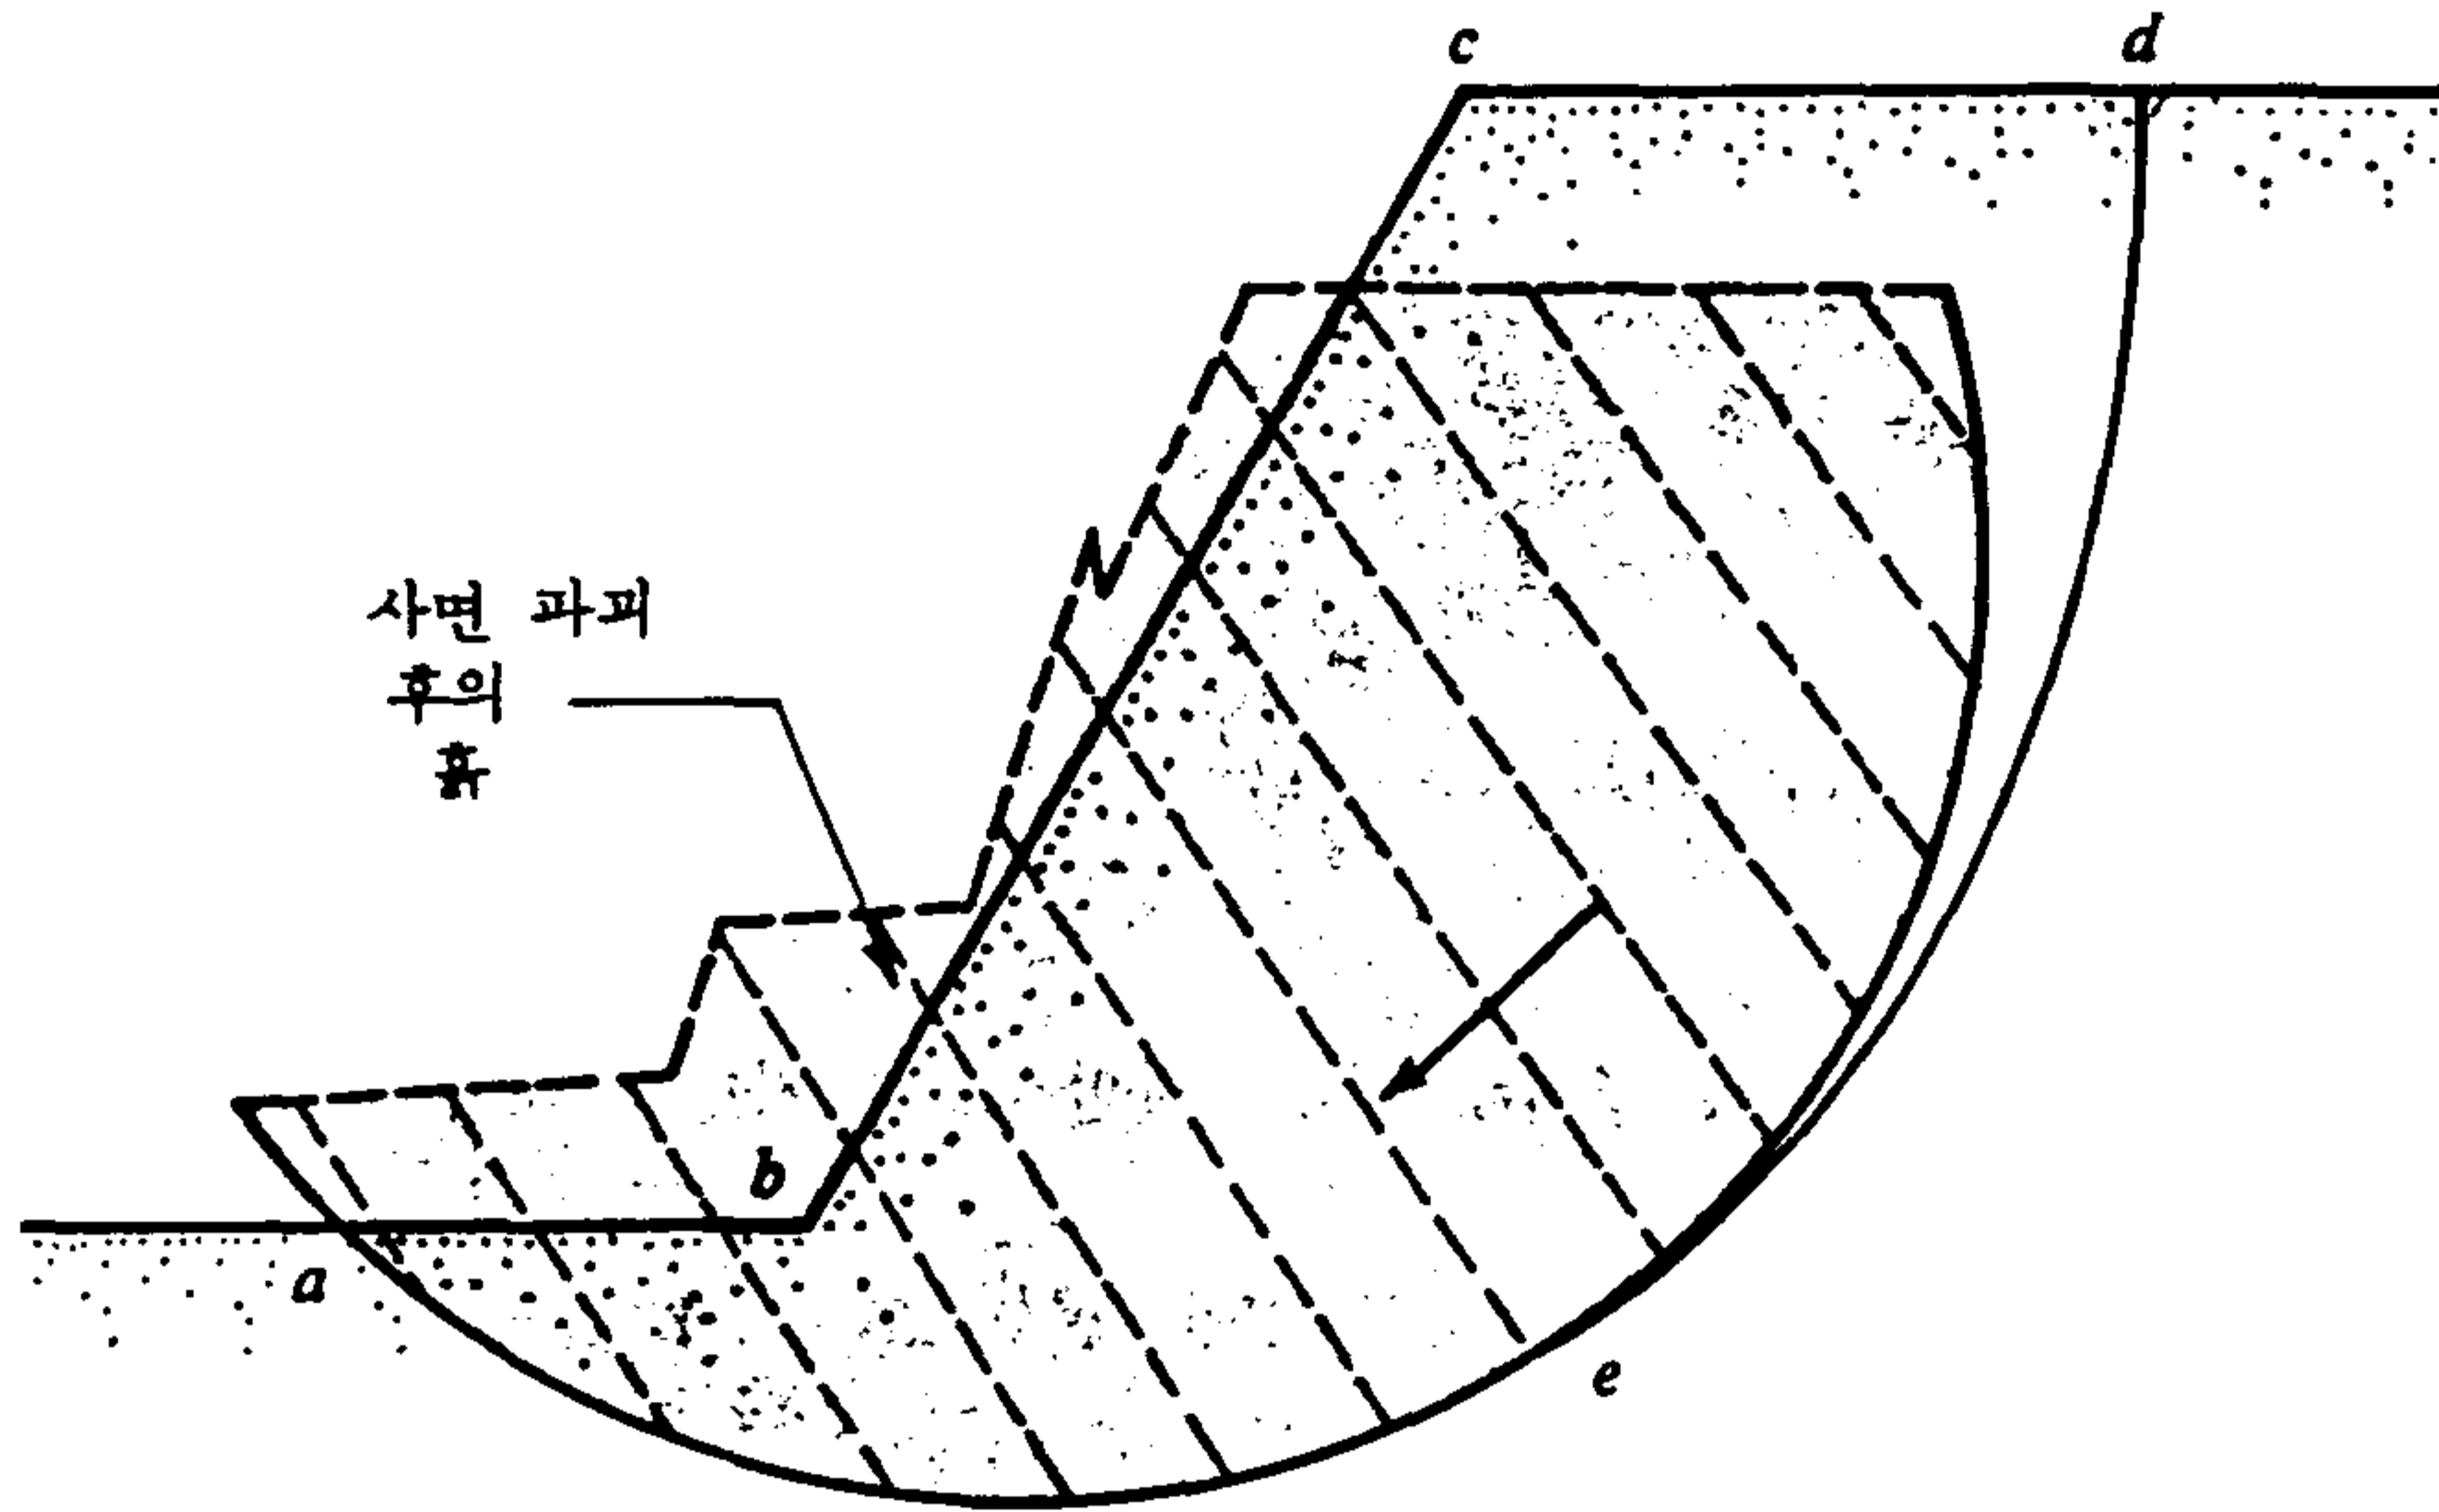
Slope failure in overburden soil, waste rock or heavily fractured rock with no identifiable structural pattern.
